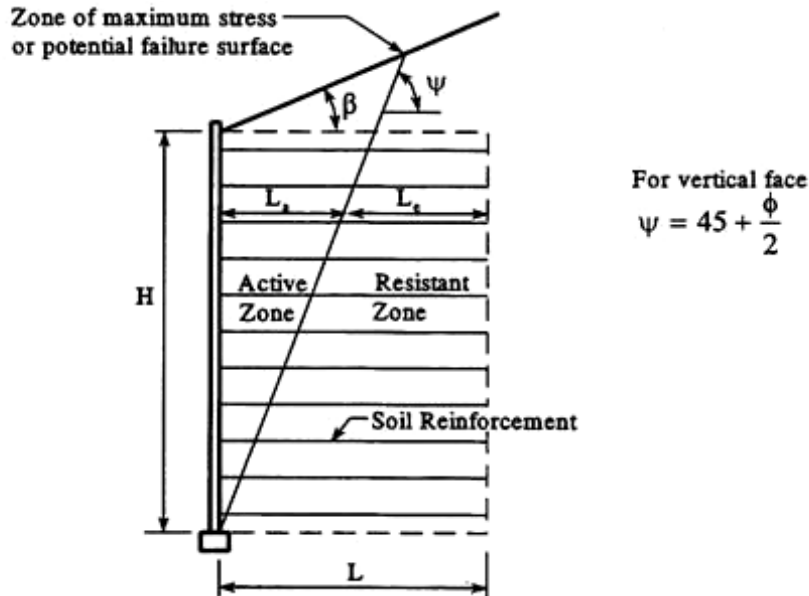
Location of failure surface for internal stability of MSE walls and extensible reinforcements (from Figure 4-9).
